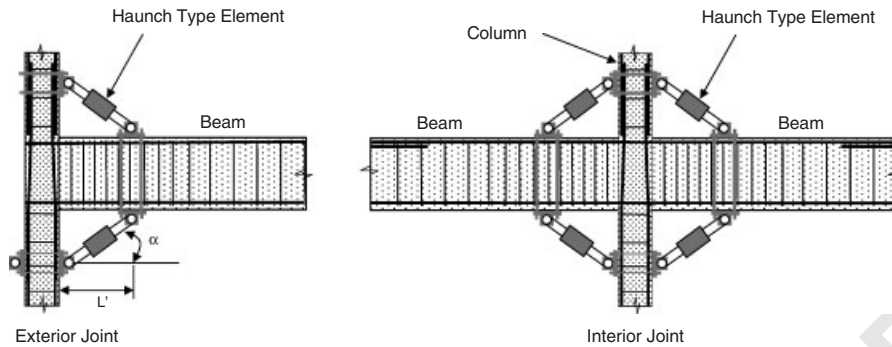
Proposed haunch retrofit configuration for exterior and interior joints.
